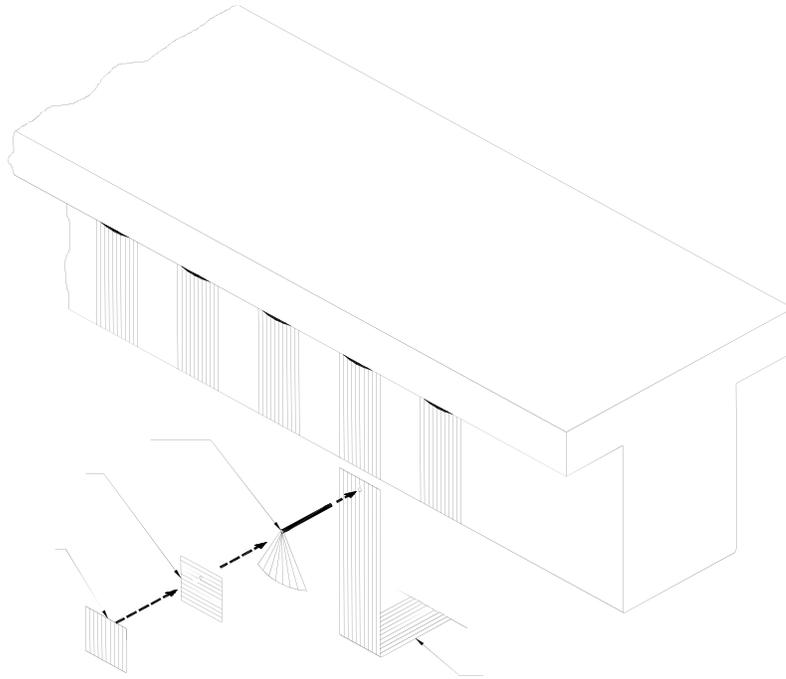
Isometric view of U-wrap with CFRP anchorage system
